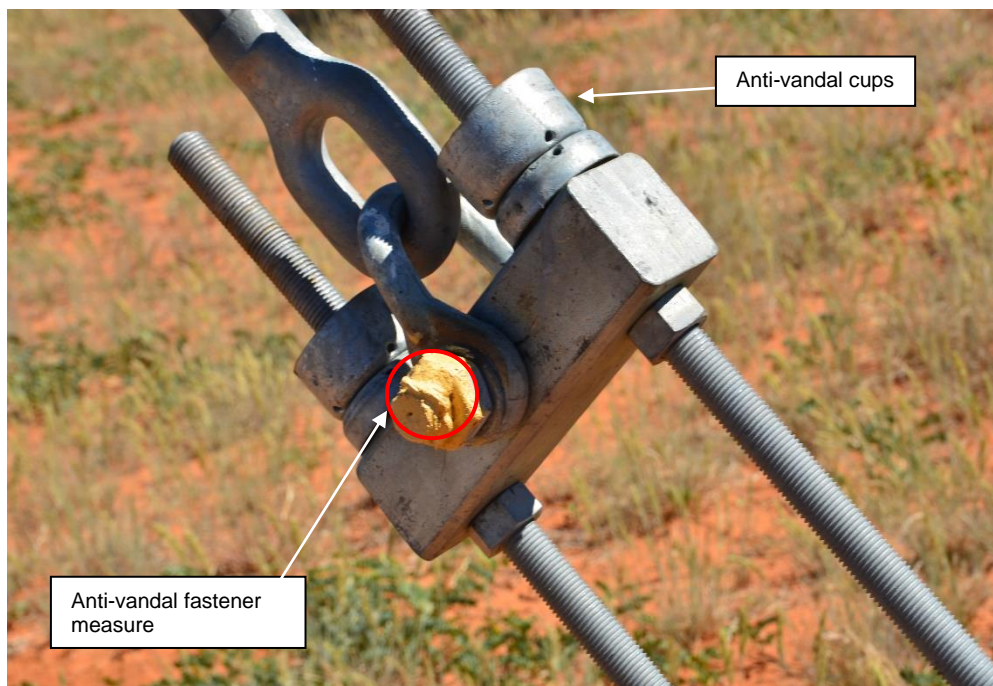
Guy anchor connection example - U-bolt anti-vandal cups and welded nut-to-bolt
